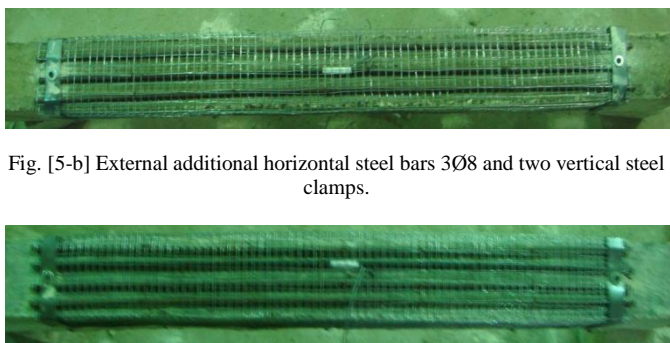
b] External additional horizontal steel bars 3Ø8 and two vertical steel clamps.
